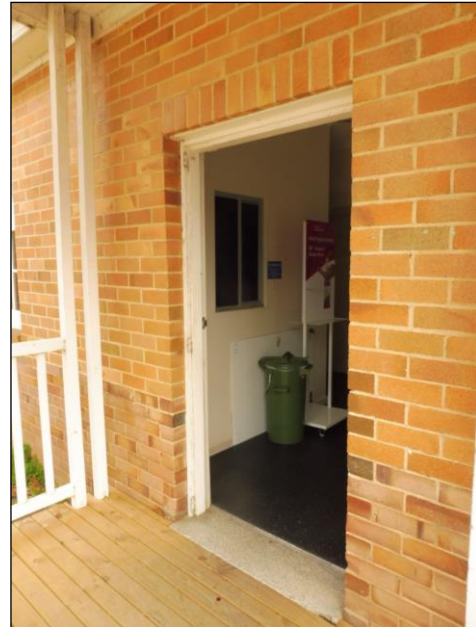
The existing external opening opens into a waiting area (infilled and extended former verandah) which has simple and modern finishes and details.
